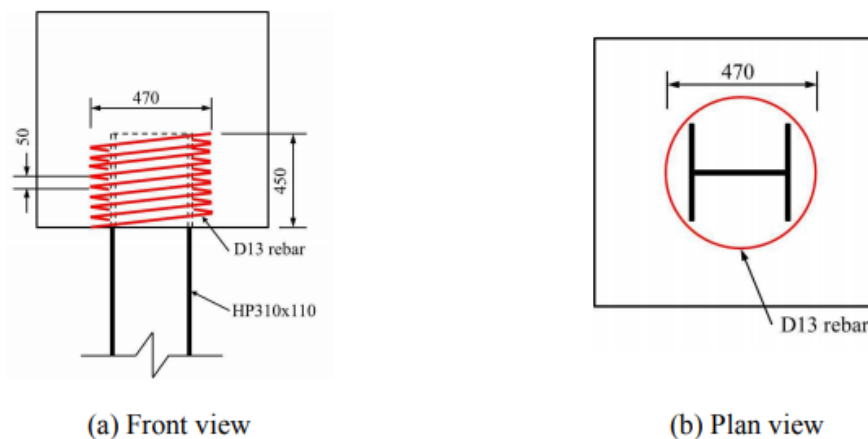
Spiral steel rebar detail.* (Lee, Kim, & Jeoung, 2013)
